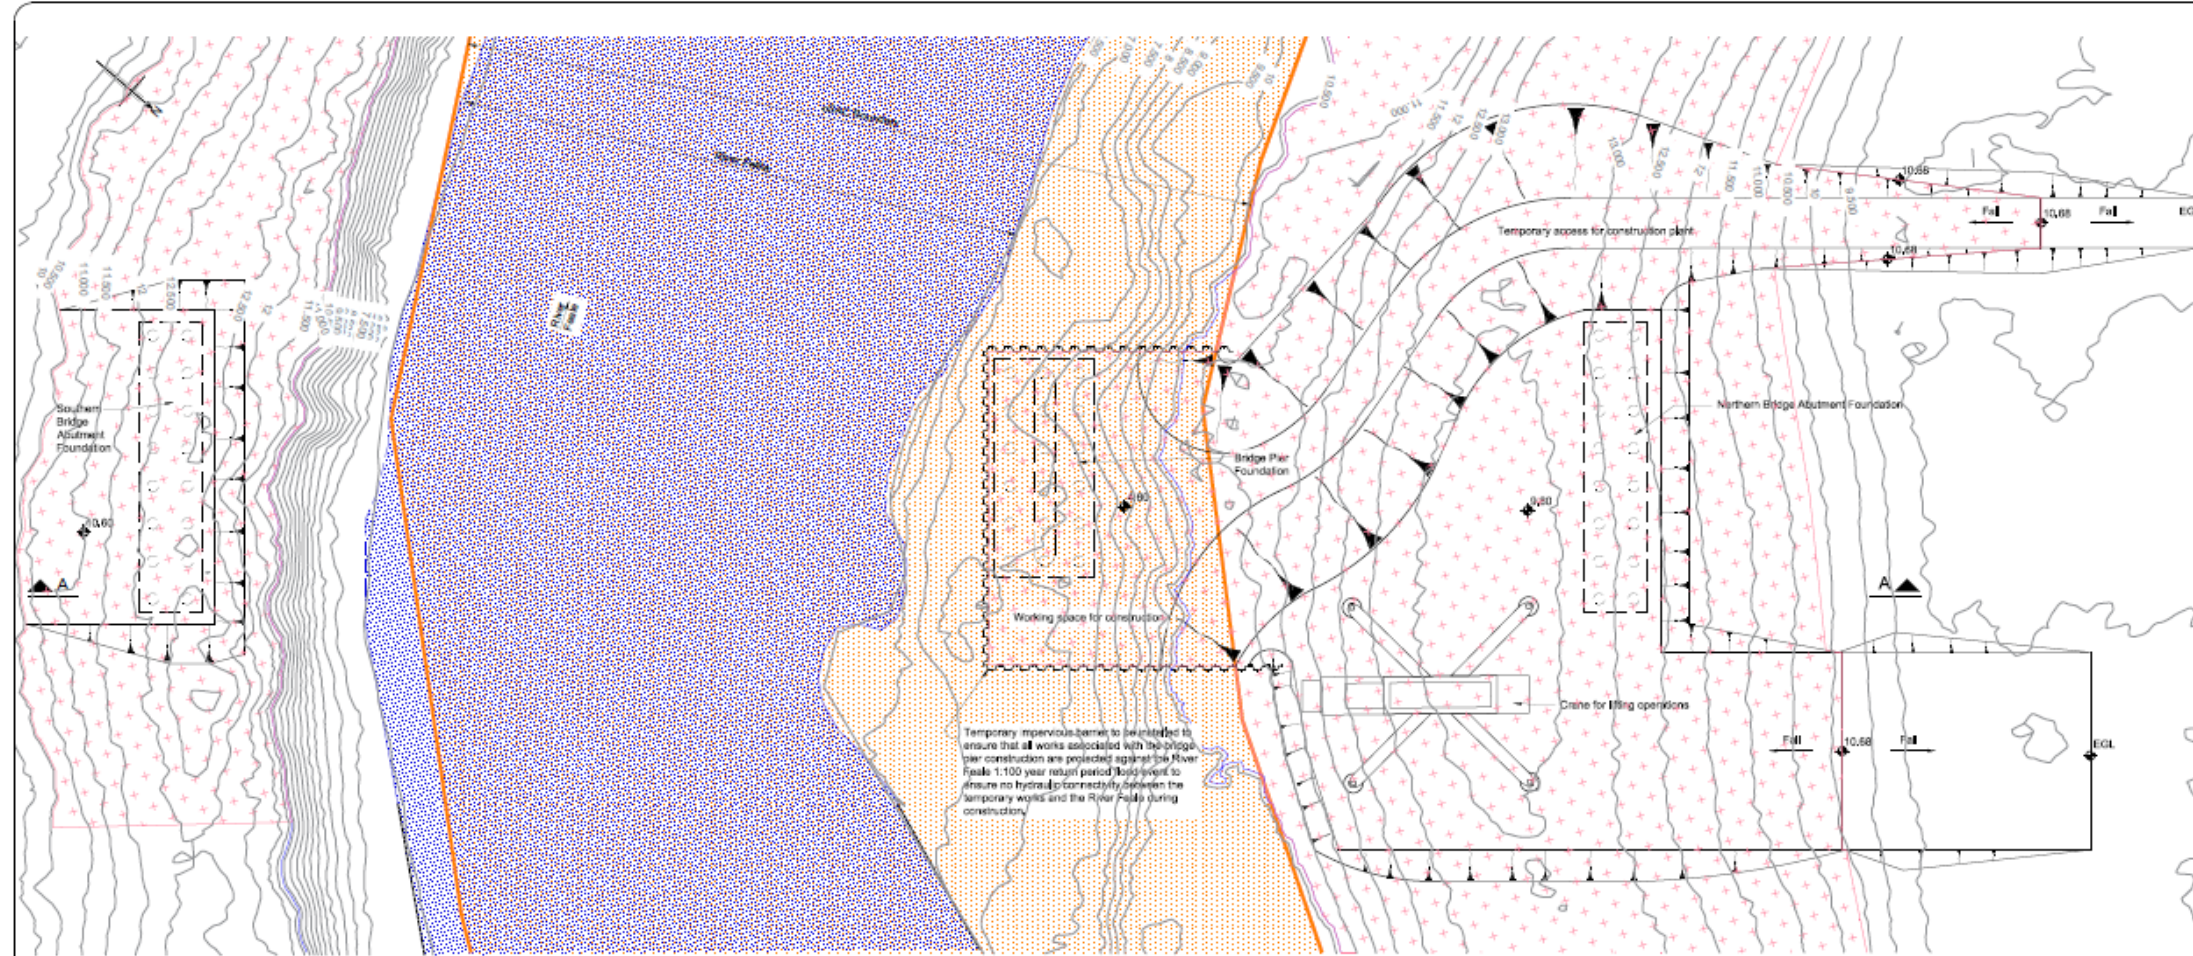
& 9: River Feale Bridge Temporary Works & General Arrangement
